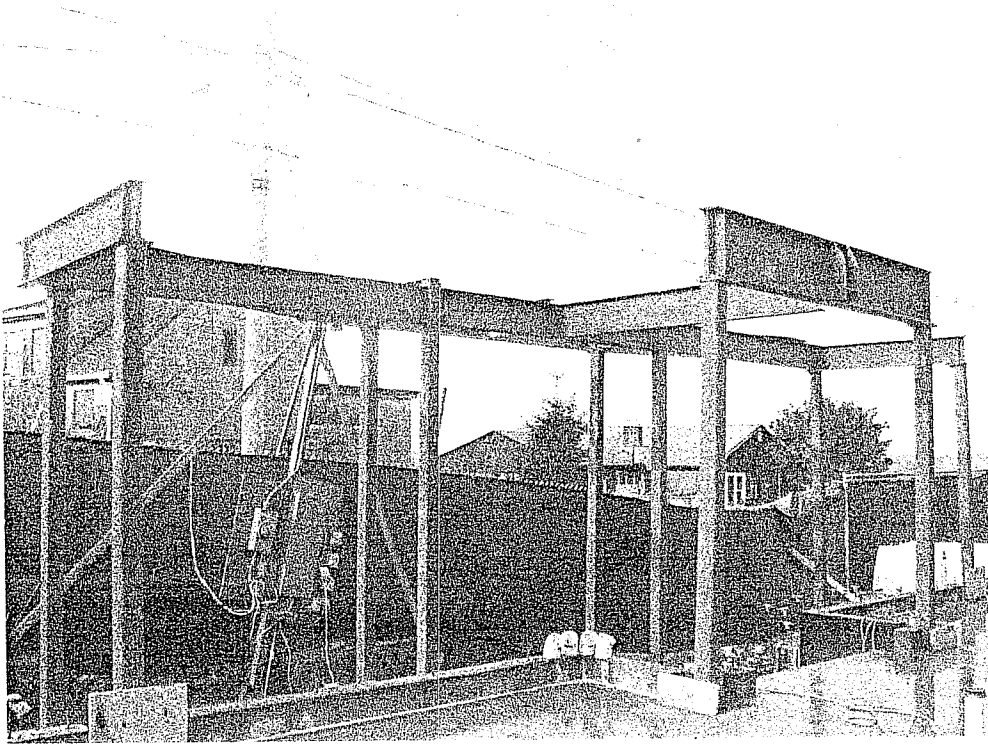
Structural steel at Grid A and AA. Shop drawings and stamped calculations for this area have not yet been provided.
